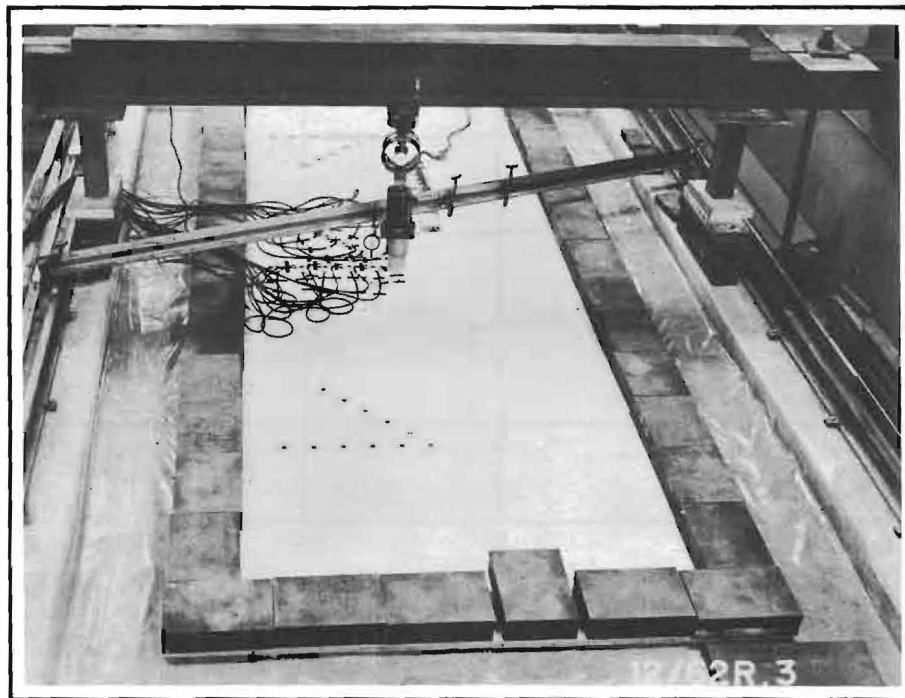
General view of test set-up used for static loading tests on Slab DM-7. The loads were applied by jacking against the reaction beam.
